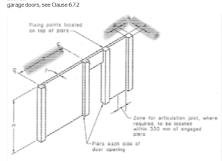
ENGAGED PIERS IN EXTERNAL SINGLE-LEAF WALLS
